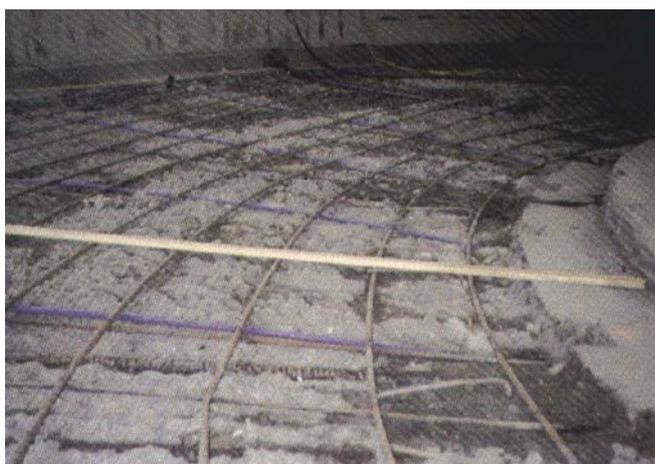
Demolished ramp slab surface with supplemental post-tensioning cables installed throughout central cylinder
